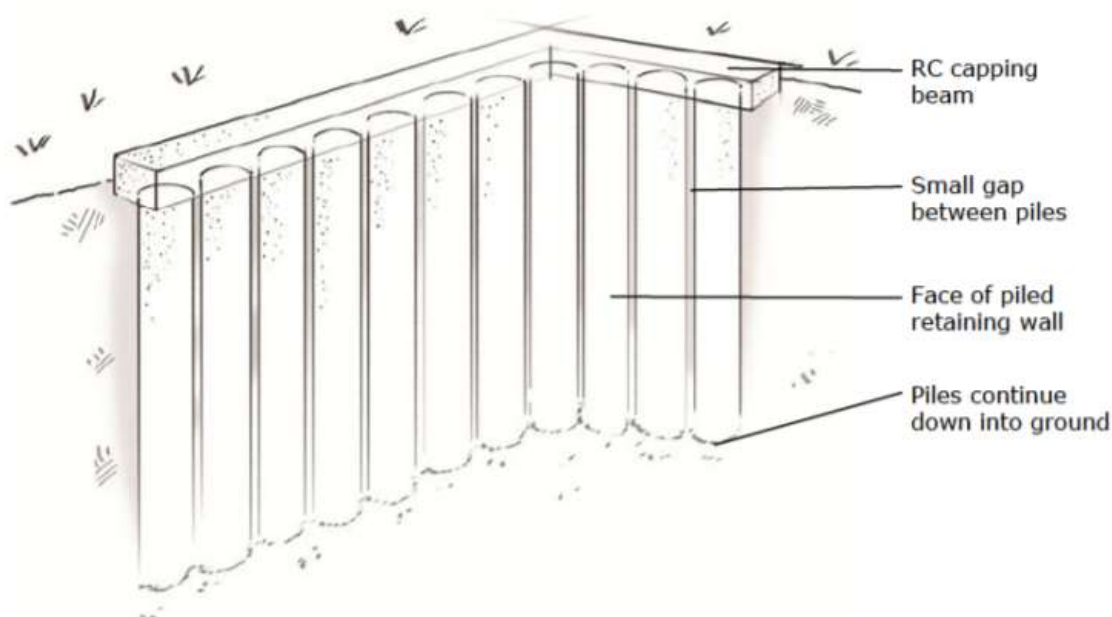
Indicative arrangement of a contiguous piles wall.
